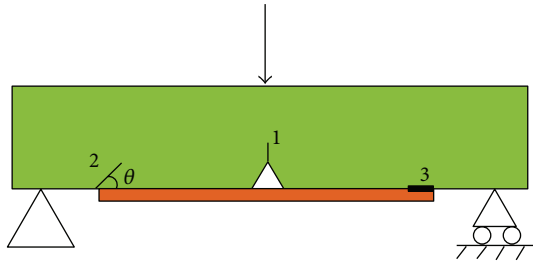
The potential crack initiation in concrete beam with CFRP.
